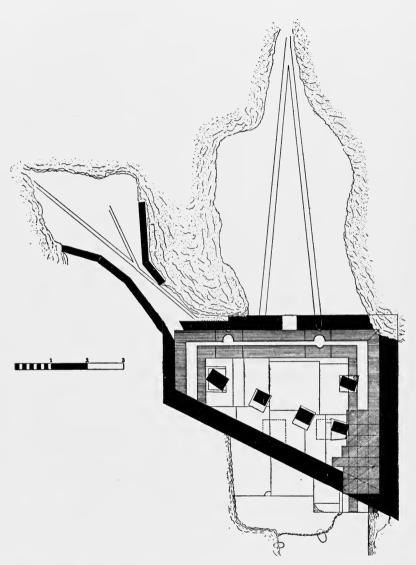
ANCIENT FOUNTAIN: GROUND PLAN OF EARLIER PORTION.
